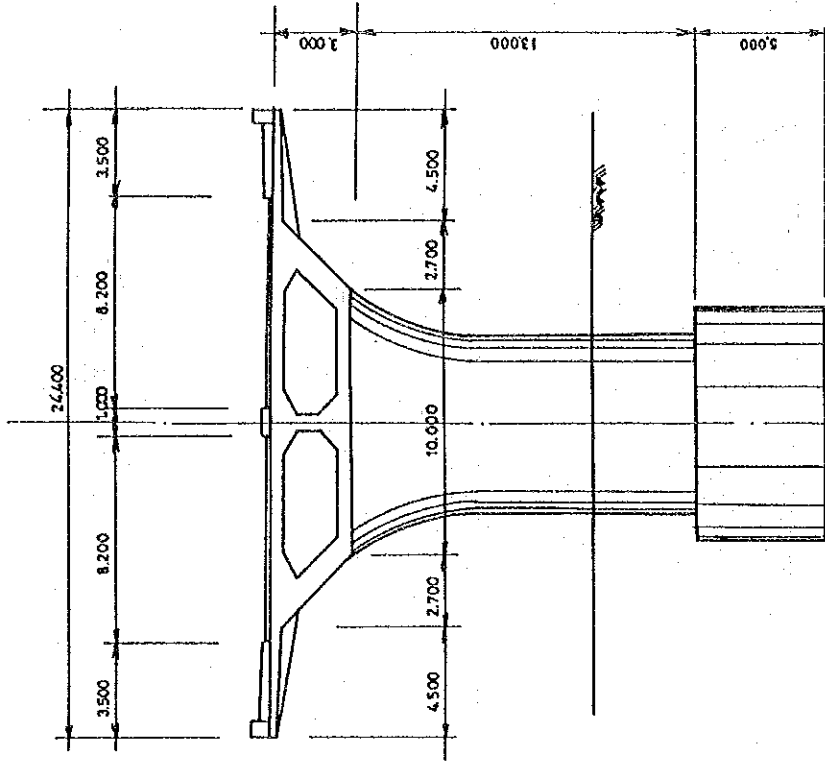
Continuous Post-tensioned Concrete Box Girder with Solid Shaft Pier on Caisson Foundation
